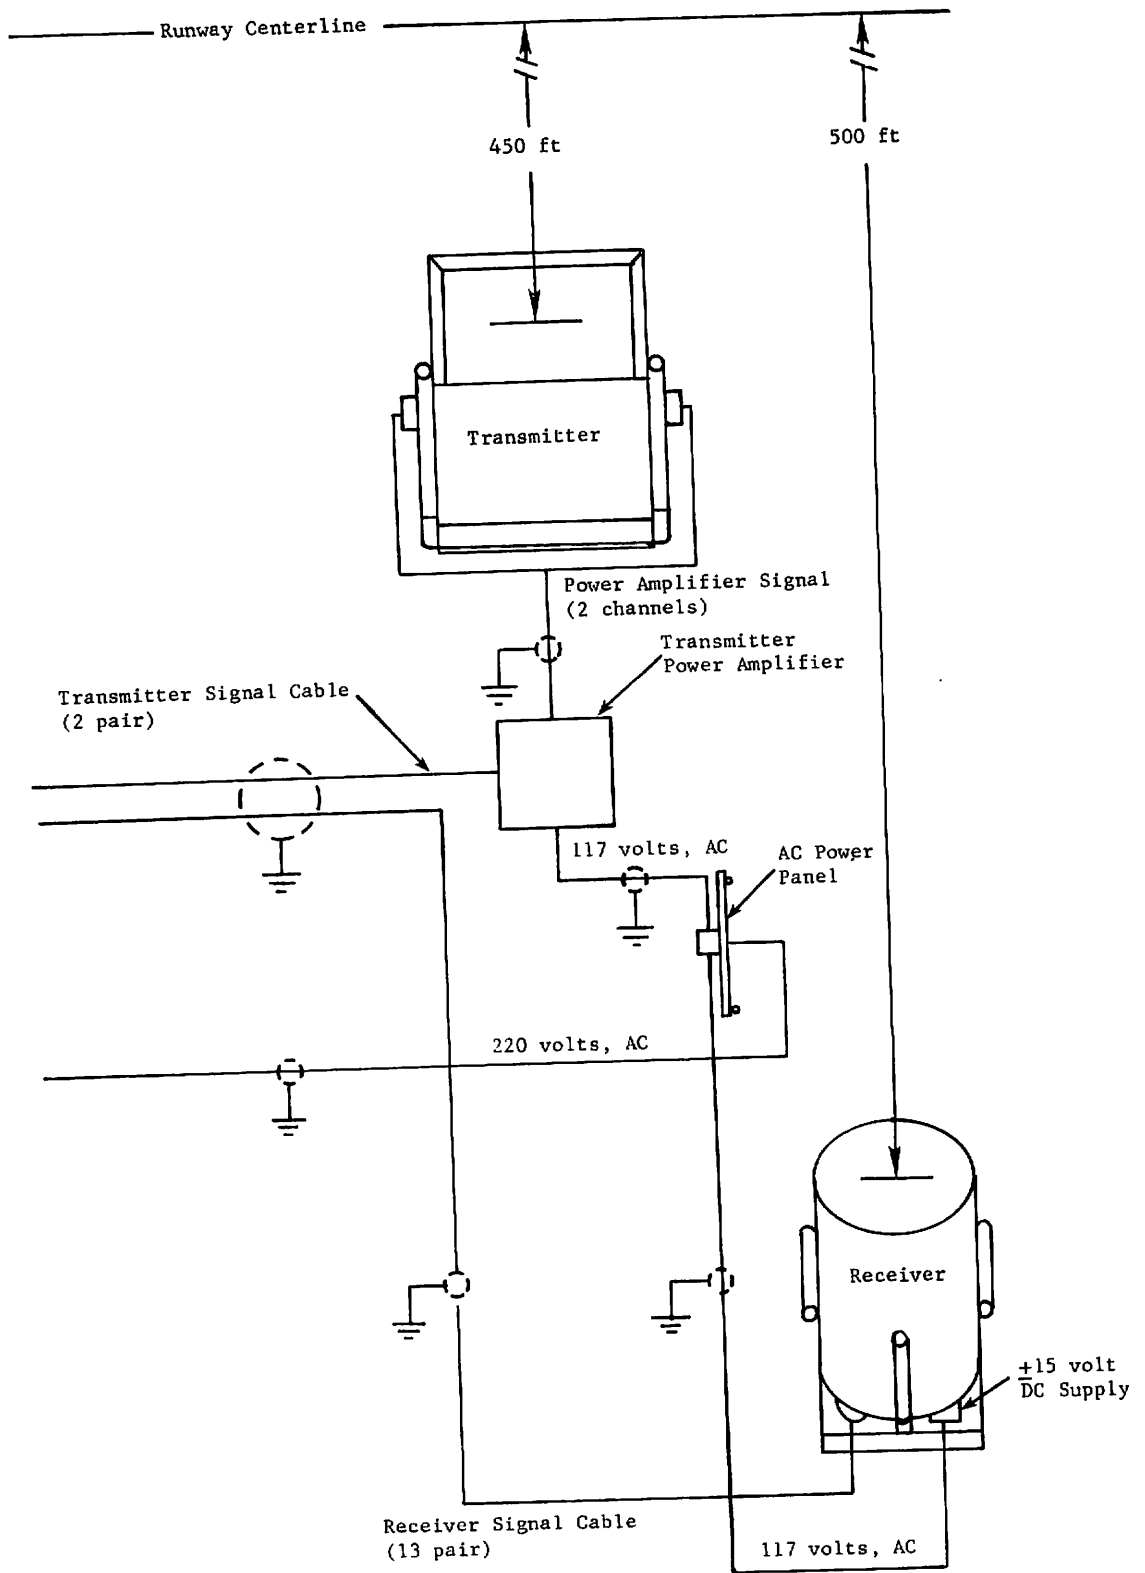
Detailed Siting Plan of the DAVSS Y-ARRAY -- Station 1
